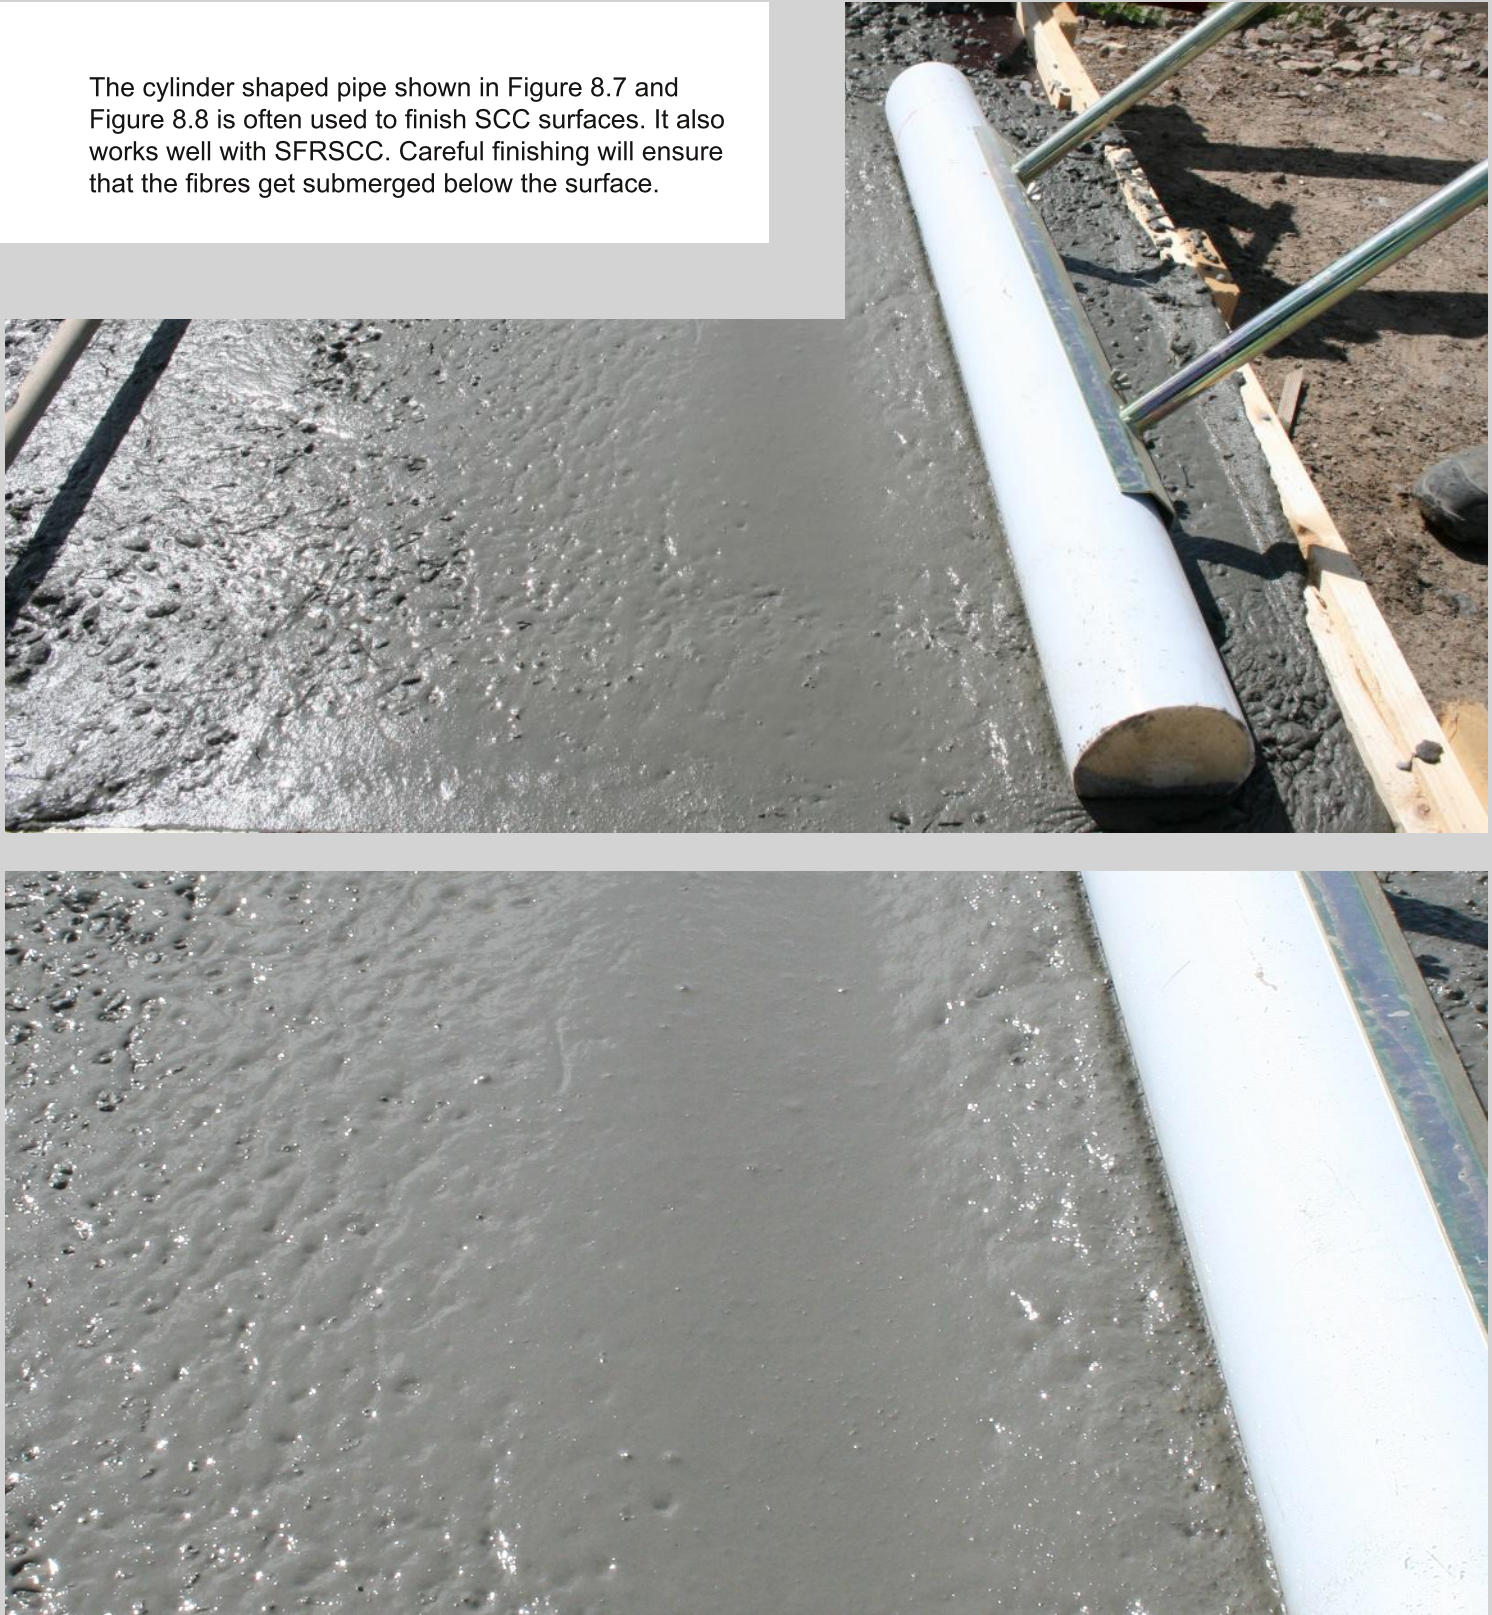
Surface finishing of SFRSCC using a cylinder shaped pipe.
